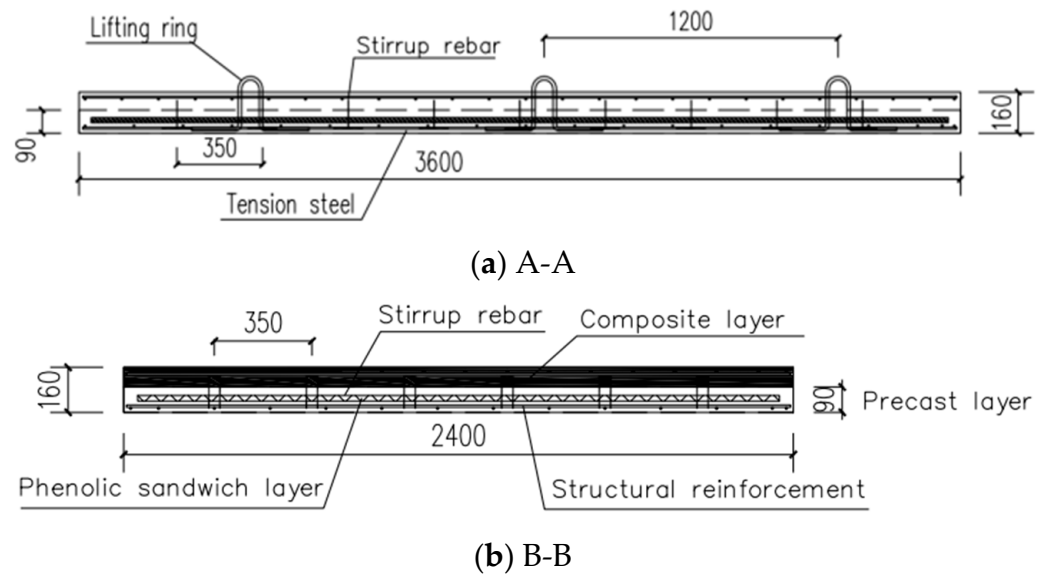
Section diagram of sandwich laminated floor slab. (a) Section A-A of floor slab; (b) Section A-A of floor slab (unit: mm).
